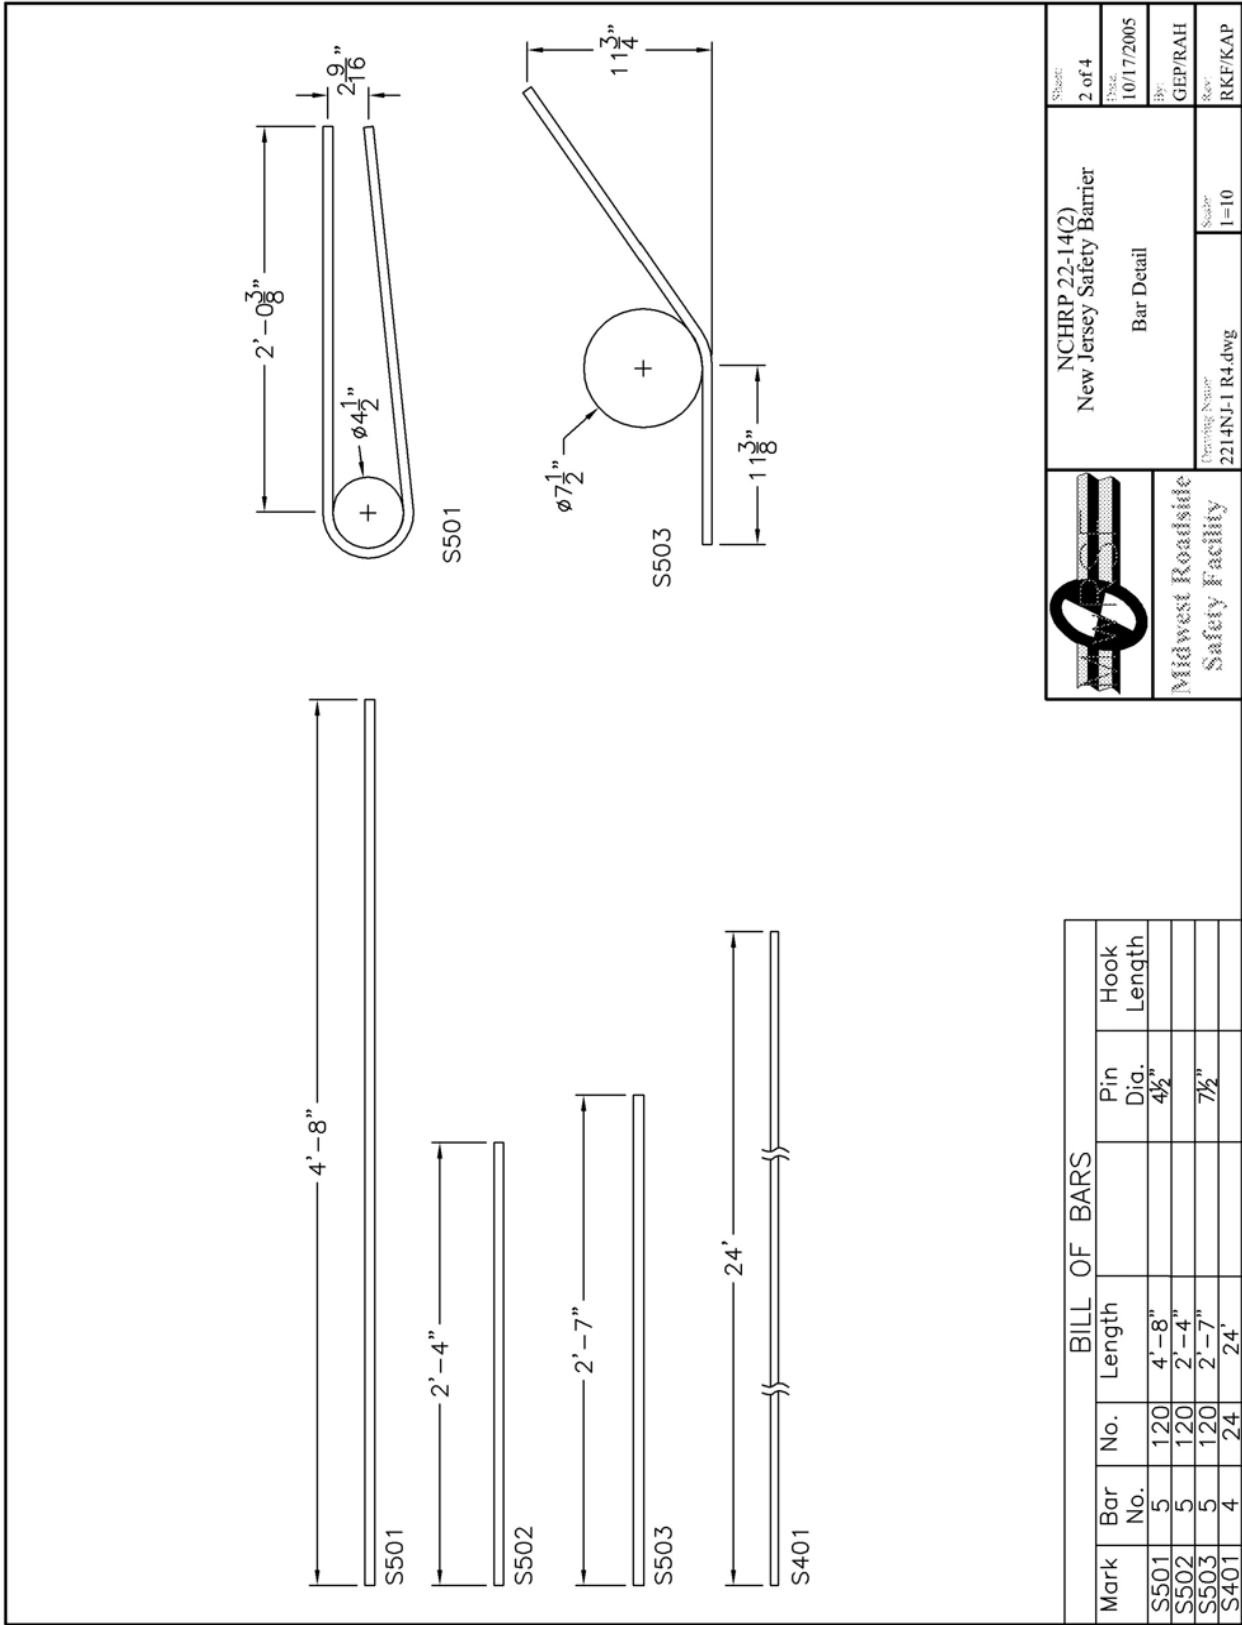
Permanent New Jersey Safety Shape Barrier Reinforcement Details (English)
